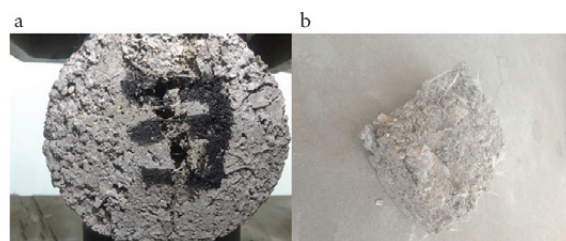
Fiber status when the cement-stabilized macadam fails: a – crack gap; b – fracture surface
